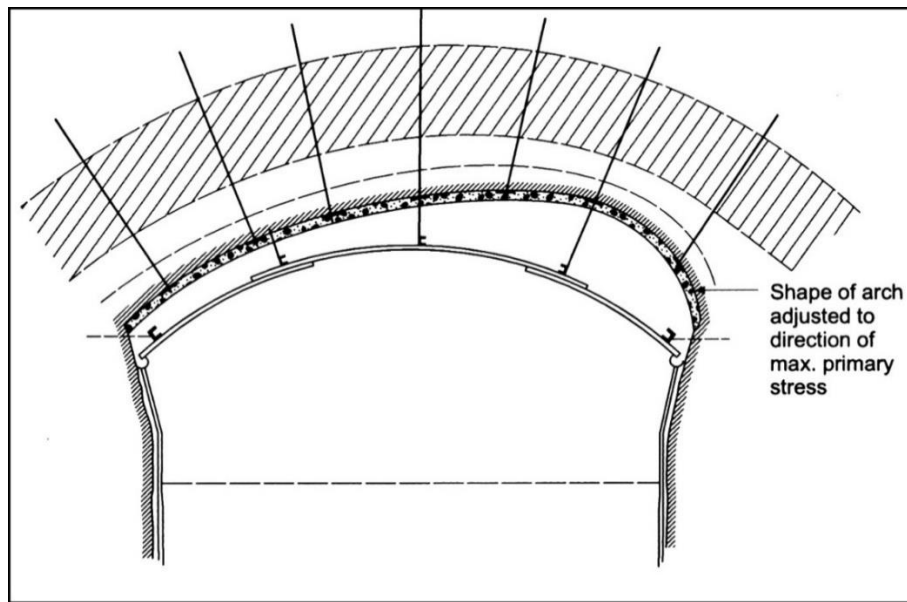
6 Typical SFRS arch with suspended light ceiling for collection of water seepage
